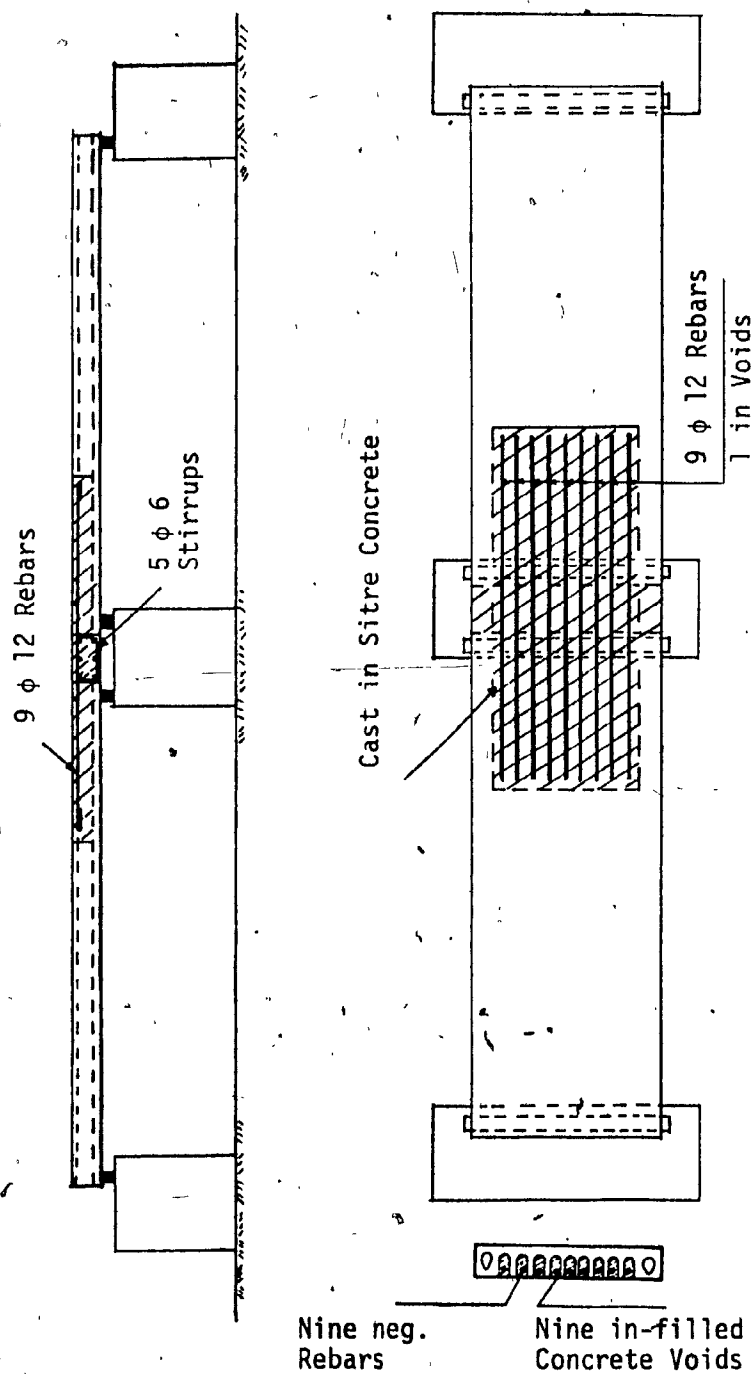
Test Set Up of Continuous Hollow-Core Slab Showing Location of Reinforcement. (Ref. 7).
